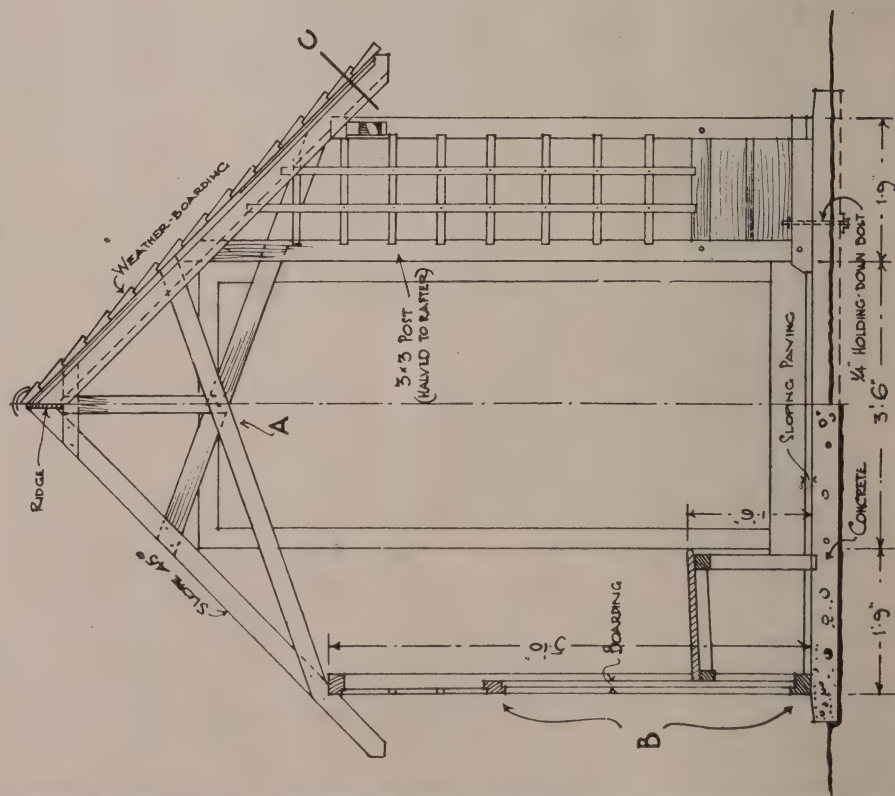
Half Section and Half Front Elevation of Trellised Porch
